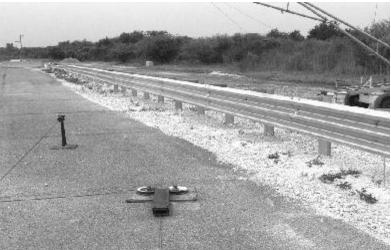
Details of the modified three beam guardrail installation for test 404211-5.
